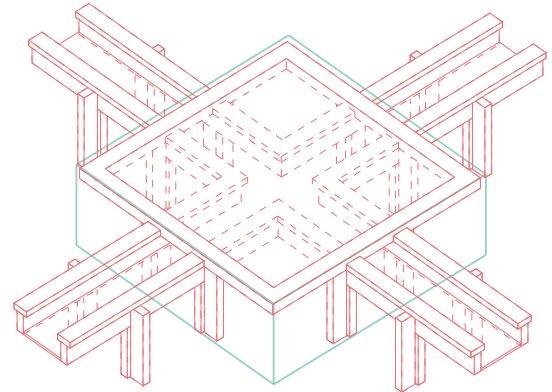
3D drawing of structural system of module(J.Lim, 2017)
